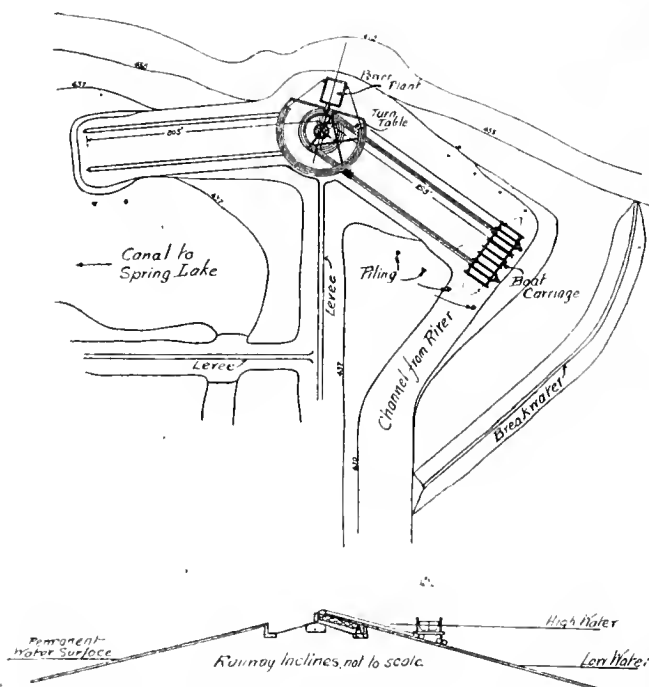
PLAN AND ELEVATION, SHOWING LAY-OUT OF MARINE RAILWAY.
